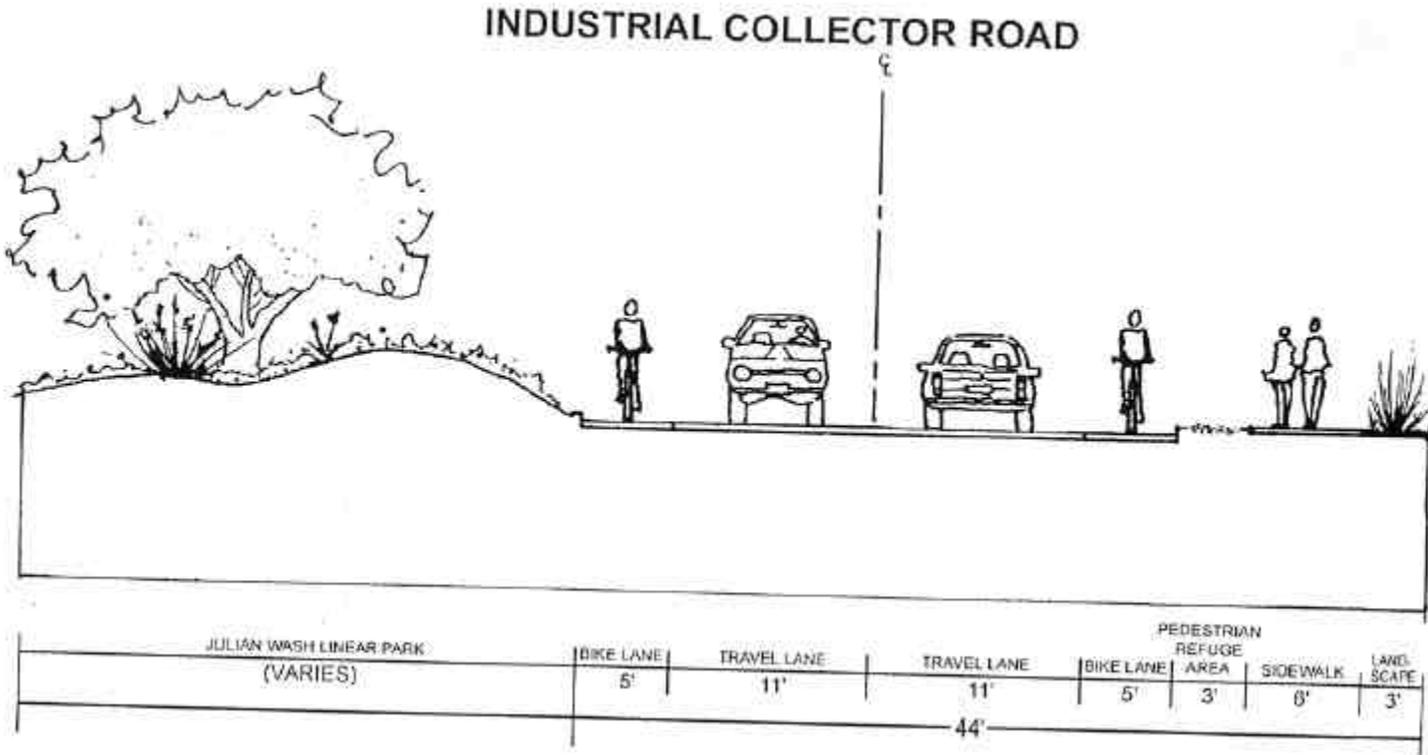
STREET CROSS-SECTIONS
